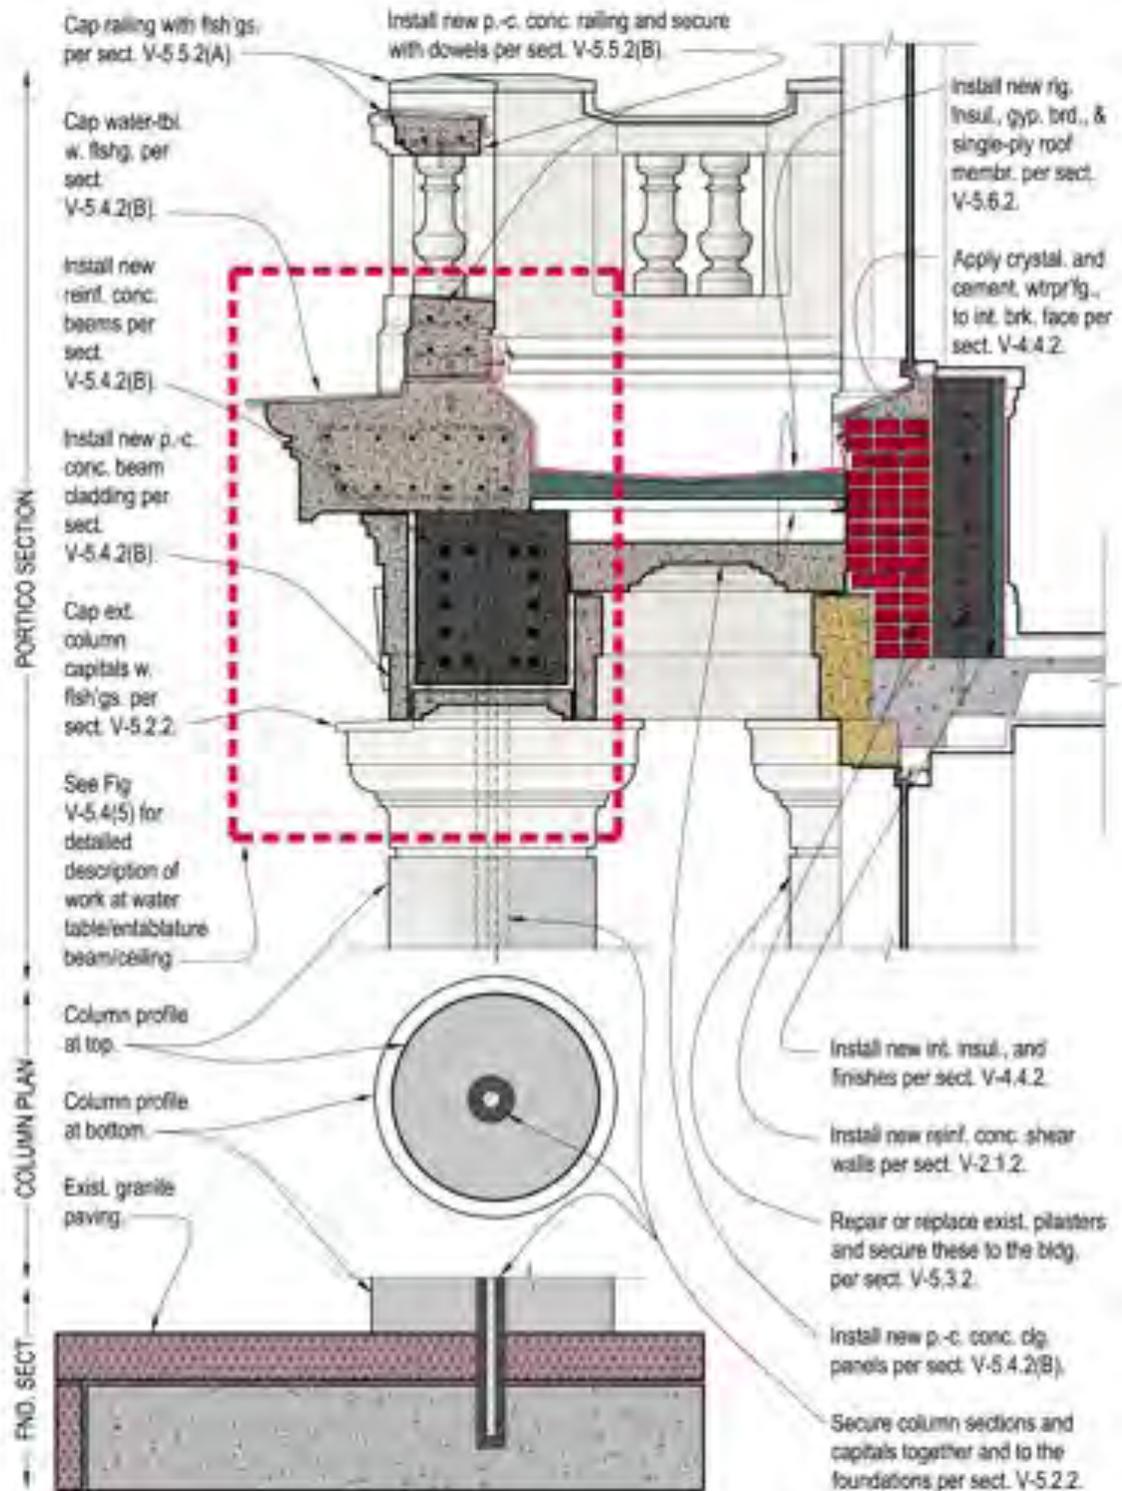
(1): Recommended Portico Roof Structure Reconstruction
